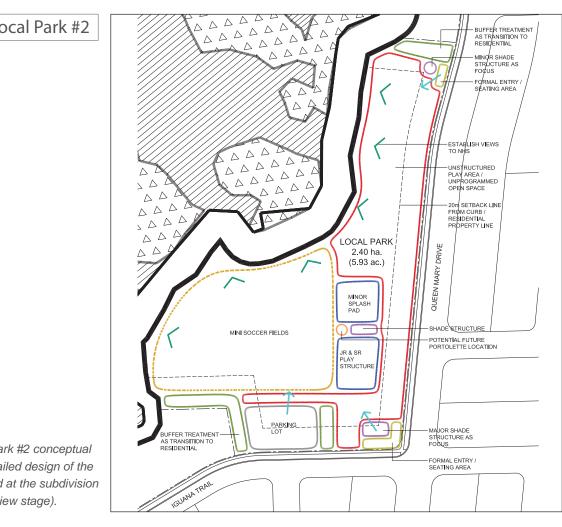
Local Park #2 conceptual facility fit diagram (detailed design of the park will be determined at the subdivision landscape drawing review stage).
